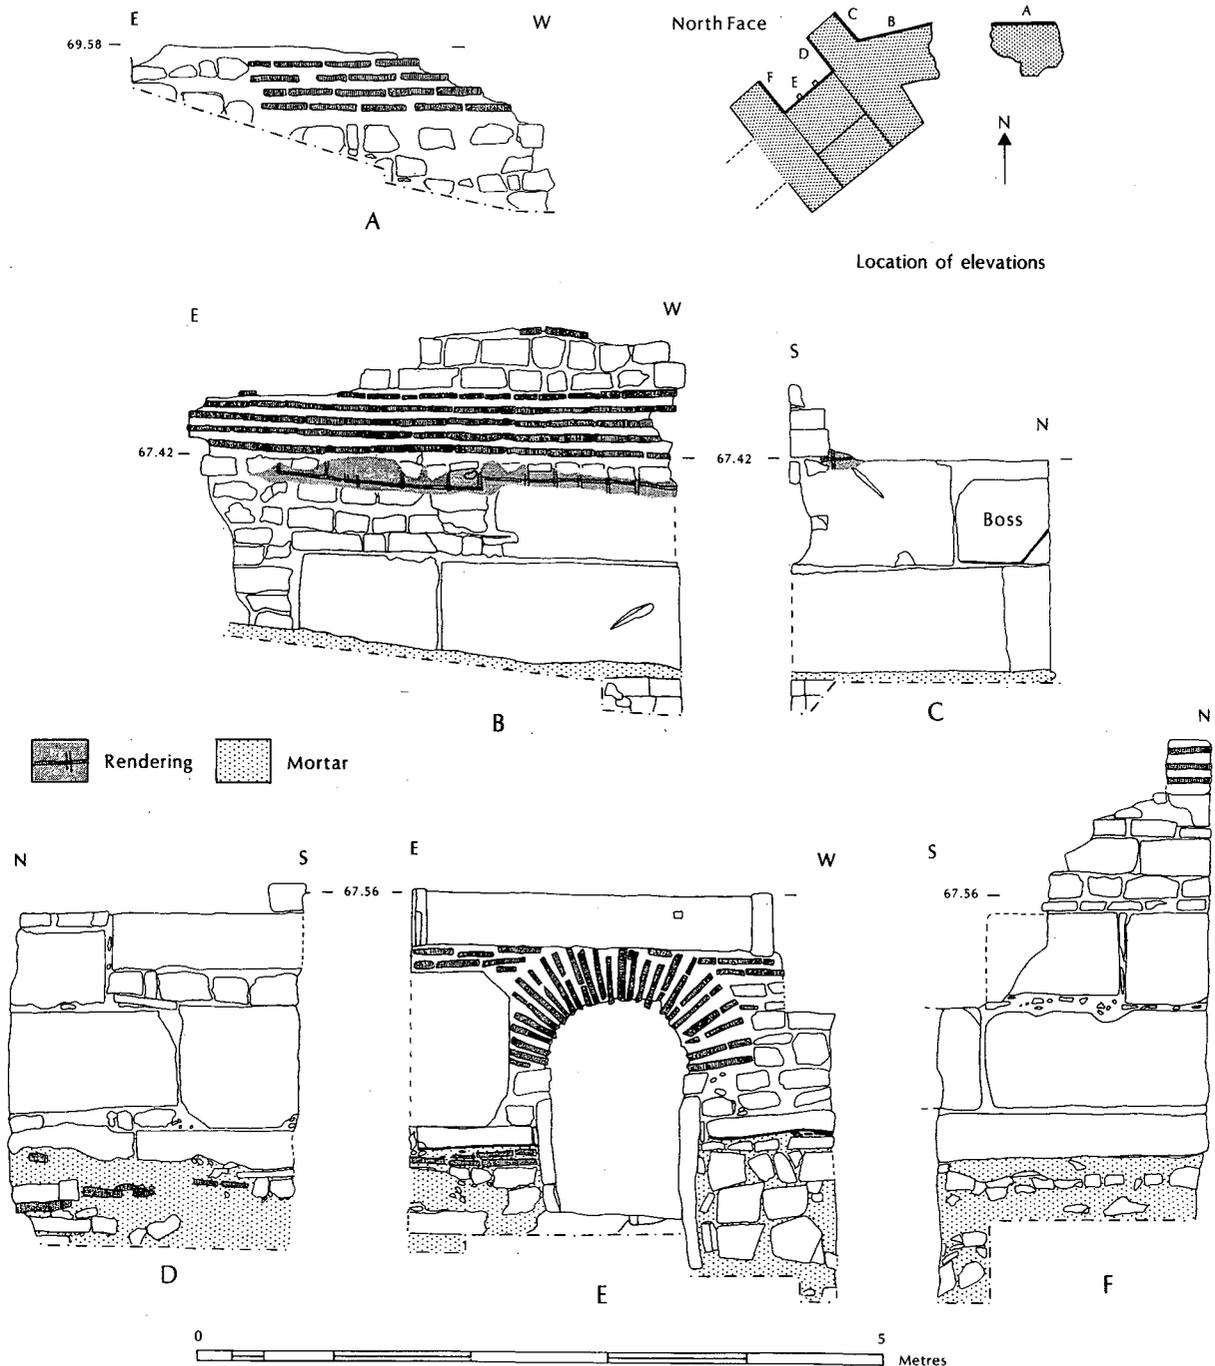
Area E. Elevations of the north side of the curtain-wall.
